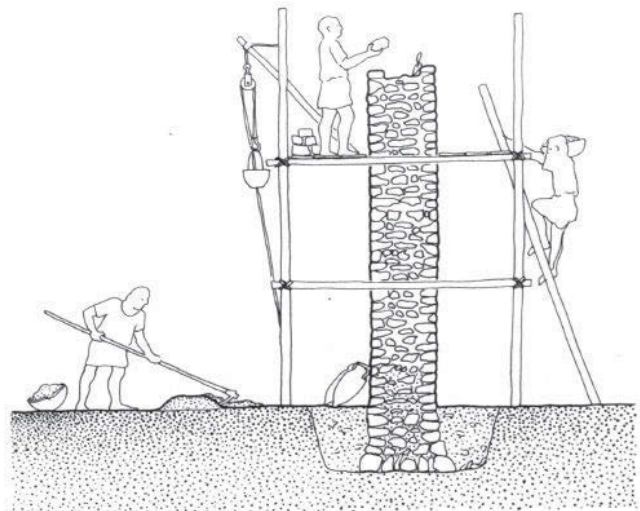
The method of constructing a concrete wall (Drawn by R Lea, after J P Adam)
